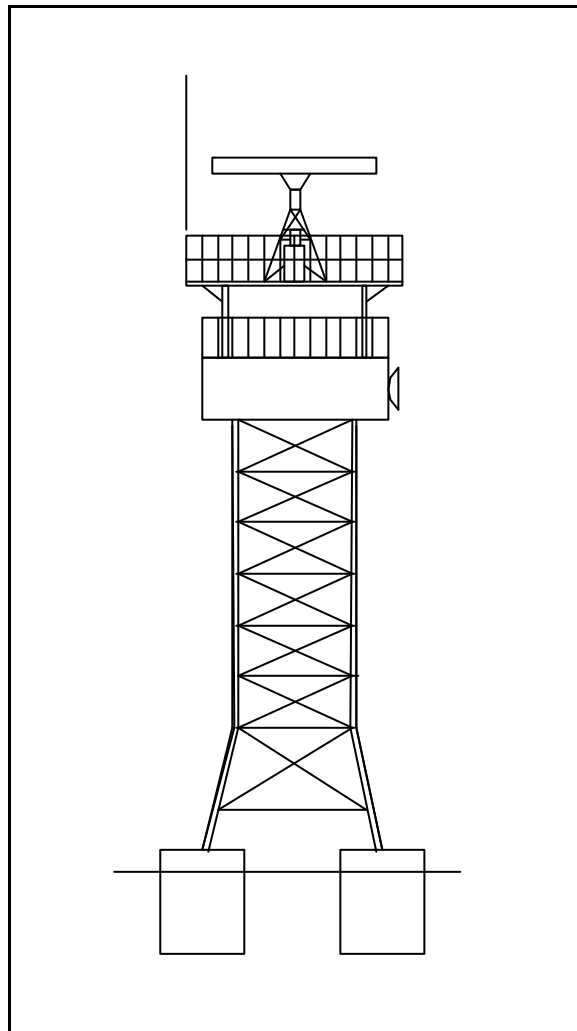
(2) Typical Layout of AIS Shore Station Site
